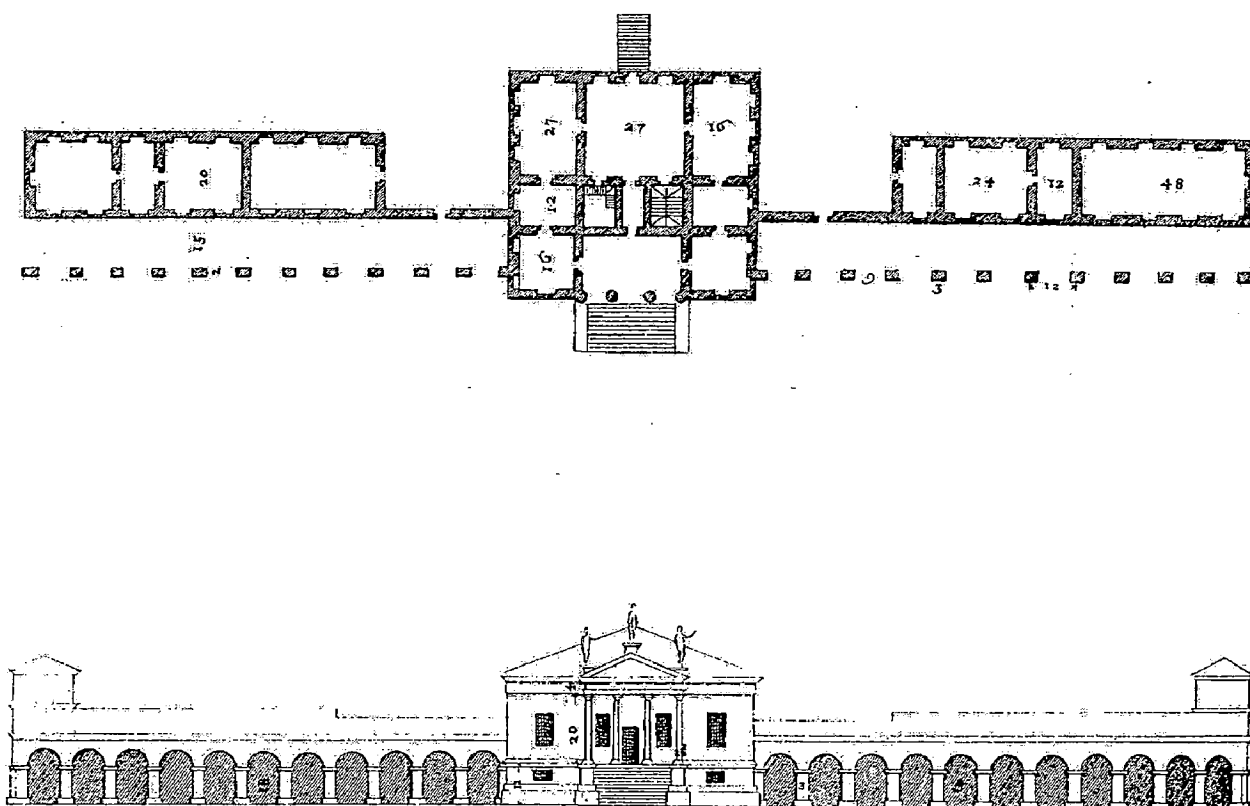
Villa Leonardo Emo (or Erno) at Fanzolo in plan and elevation
